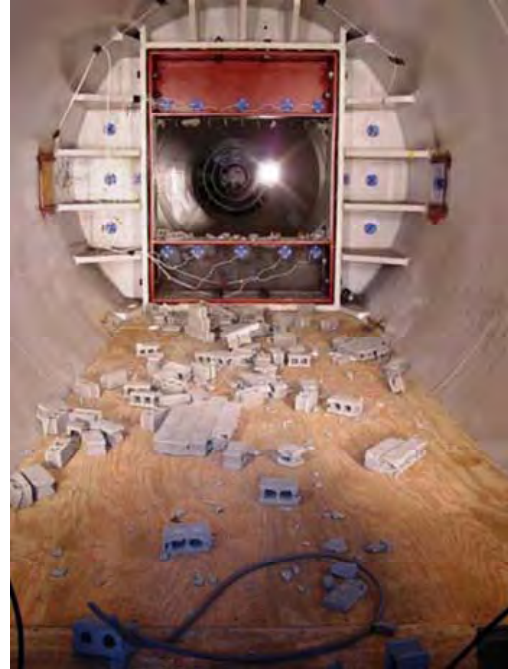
Test wall inside Blast Load Simulator      Figure 14 – Aftermath of test on concrete block wall in BLS.
